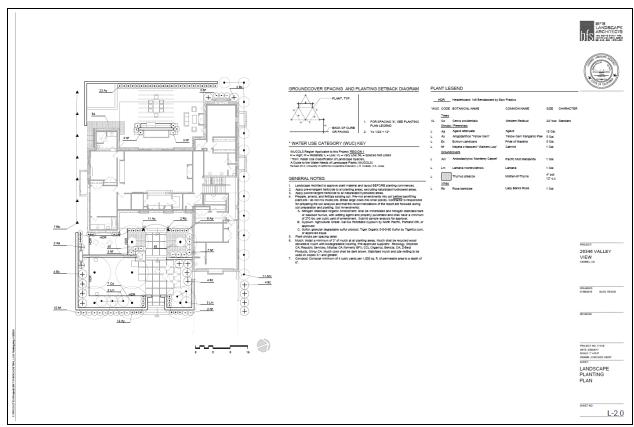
L-1: Proposed Landscape Planting Plan at 26346 Valley View Avenue
